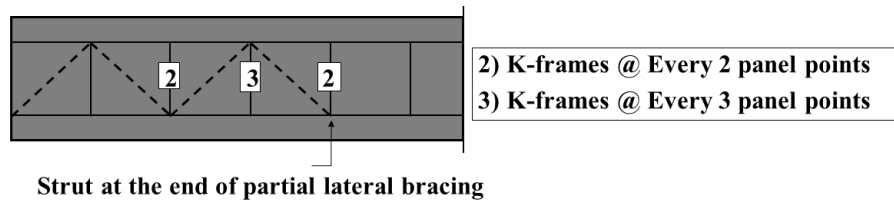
Scheme of K-frame Location - 1-Span TUB90 Girder with L/D=25
